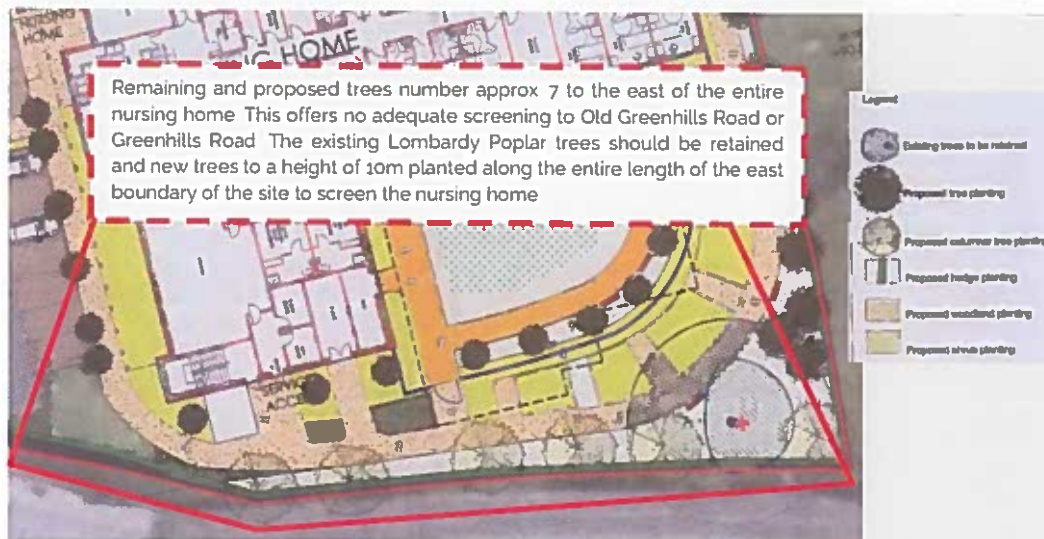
Landscape Plan shows significant screening trees removed and minimal trees remaining/proposed
